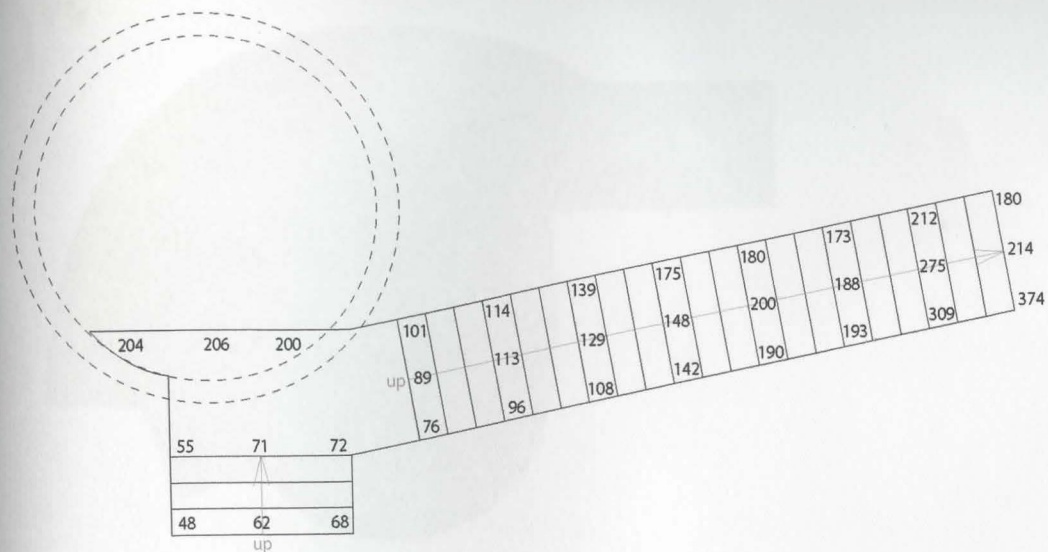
The result of light measurement (first floor to second floor) [lx]
